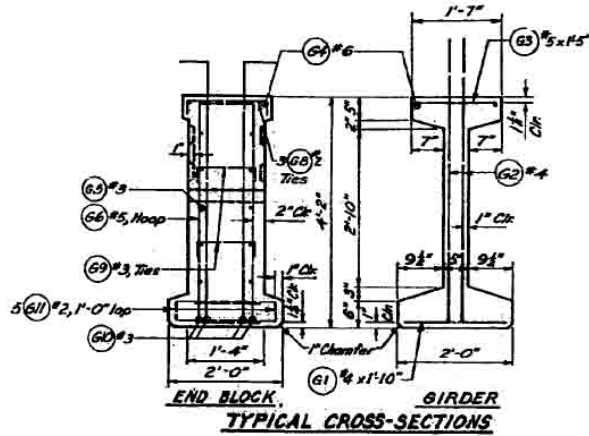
Bridge 512/19 Girder Detail
